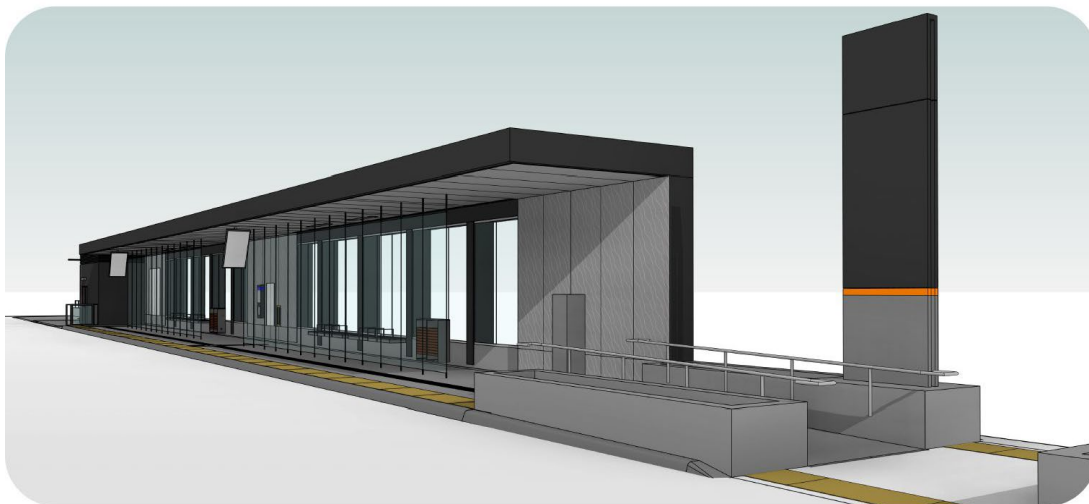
Rendering of a future BRT Shelter along Dundas Street
